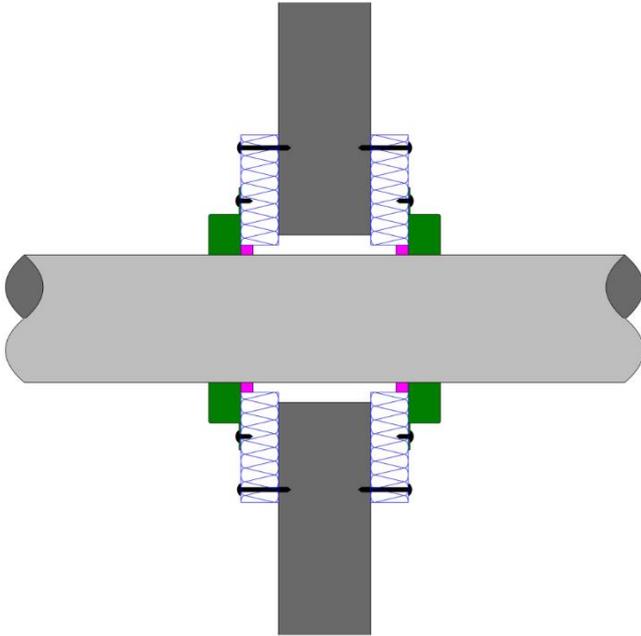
Typical installation of pipes fitted perpendicular to wall with single layer of BOSS Batts pattress-fitted in aperture and BOSS MaxiCollar™ on both faces
